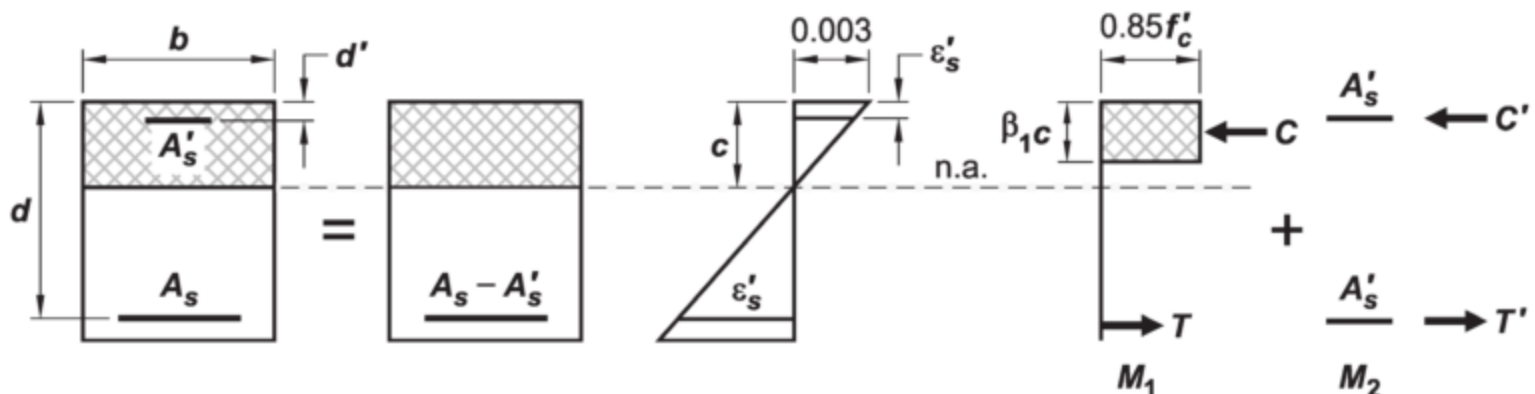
Forces in a doubly reinforced concrete beam.
